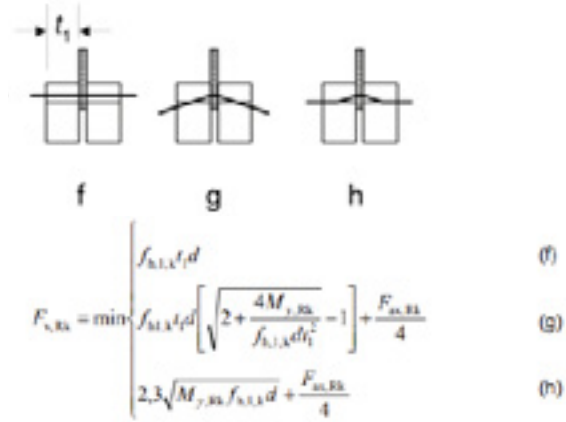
Failure mechanisms (NEN-EN 1995-1-1)
